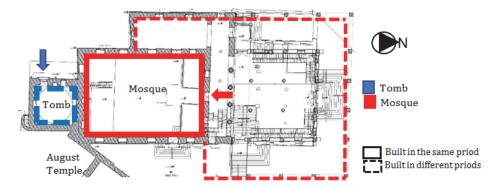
Ground Floor plan drawing of Hacı Bayram-ı Veli Mosque with new additions shown in different colors (Source: rearranged from Archives of Directorate General of
